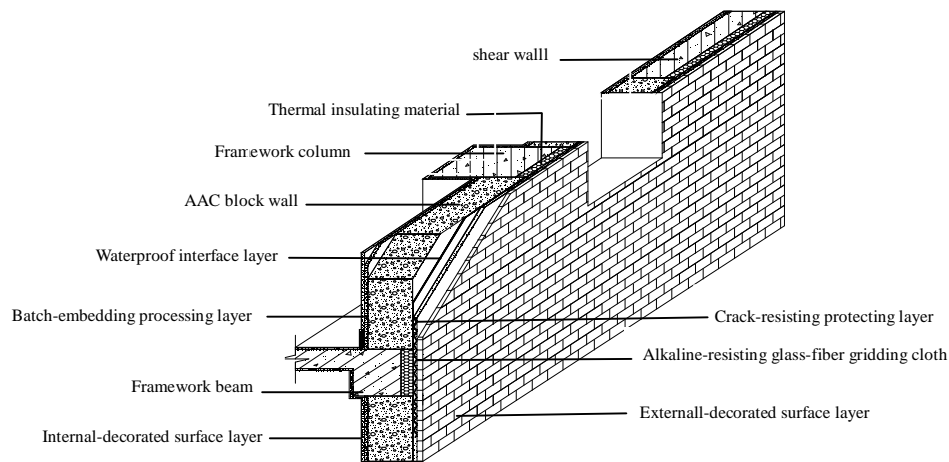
Structural diagram of self-thermal insulating wall of AAC block
